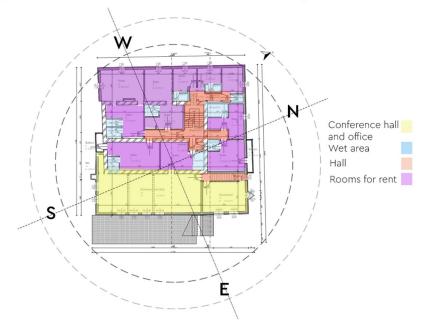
Orientation of the first-floor plan with areas (Source: by Author)
